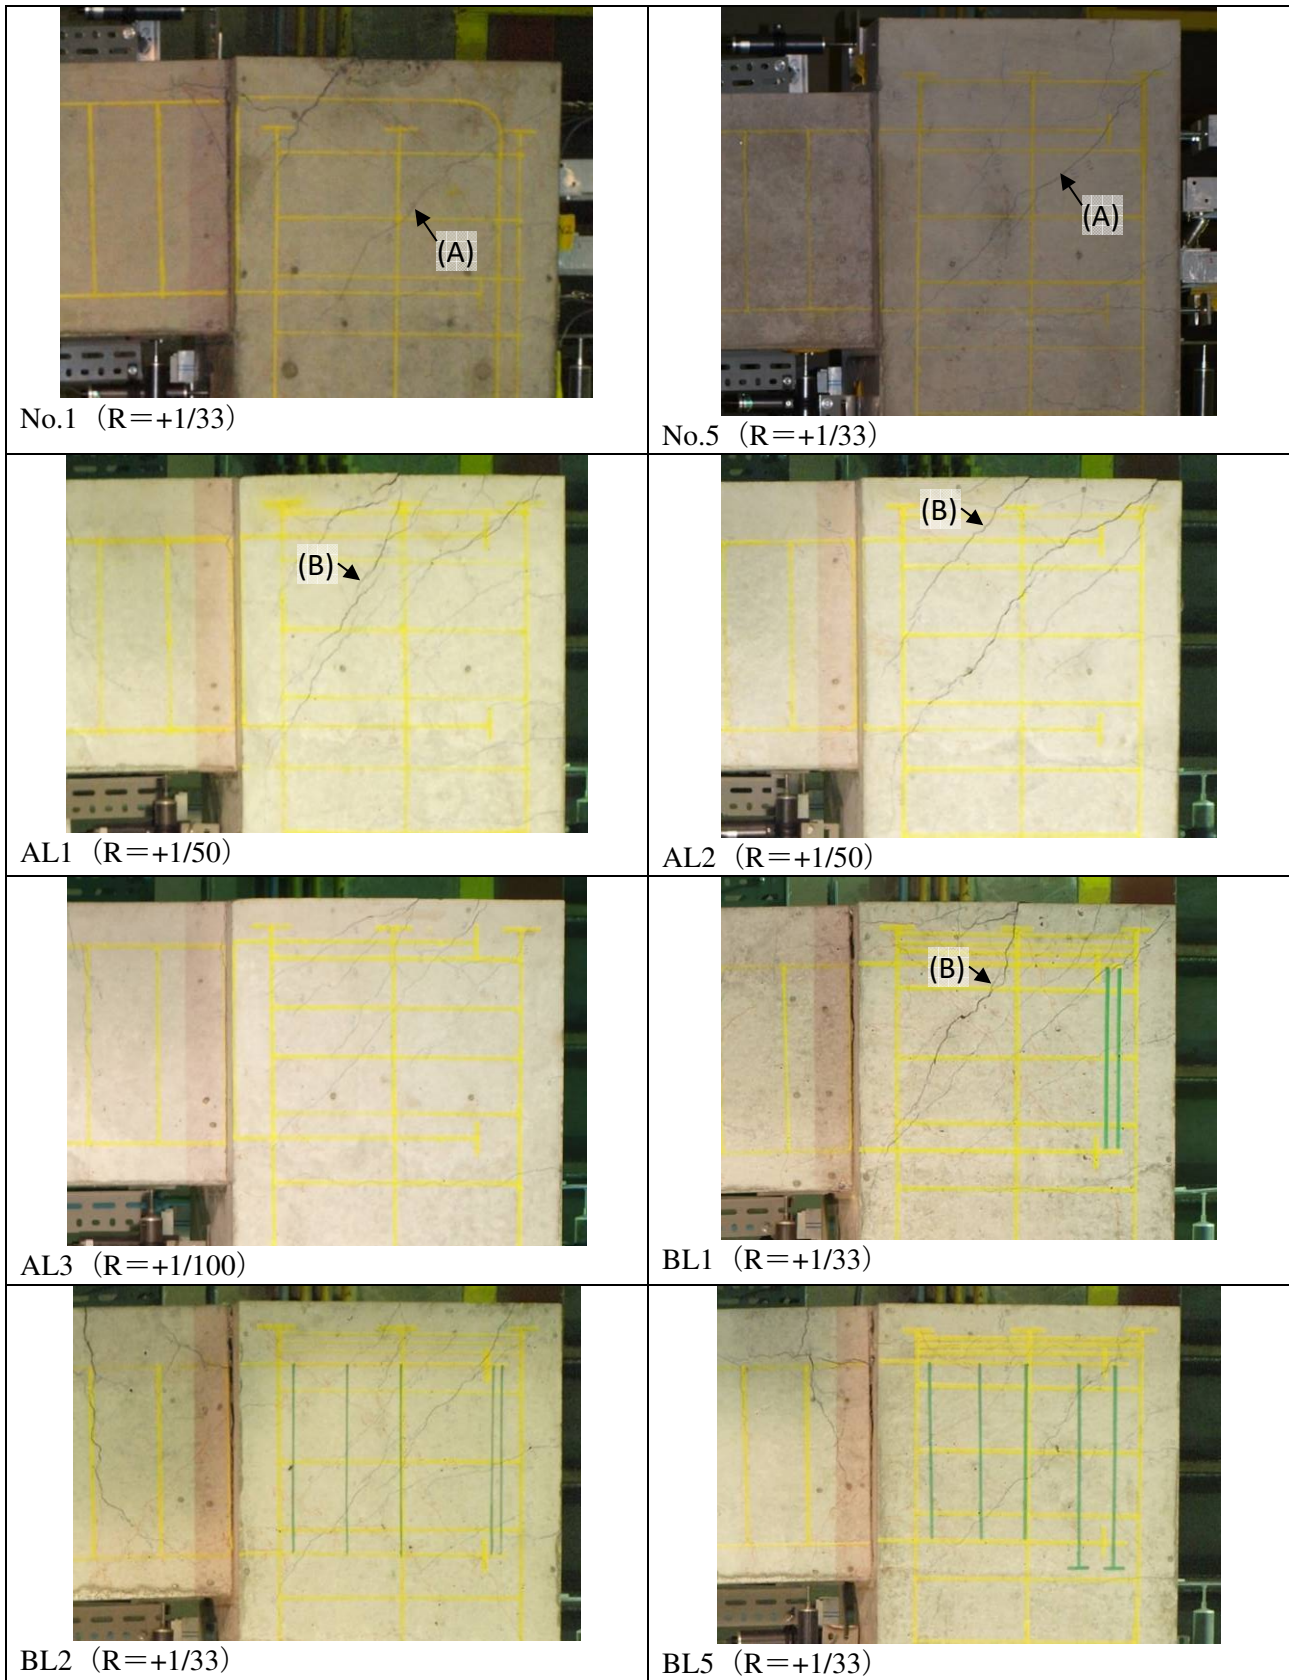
Damage Condition of the Beam-column Joint at the Maximum Strength
